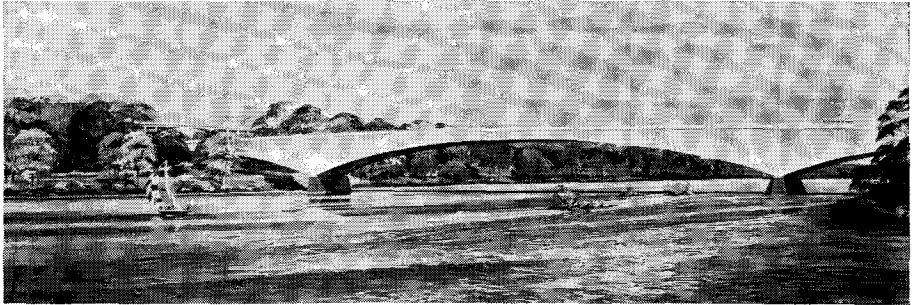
Proposed prestressed concrete cantilever bridge for I-266 Potomac River crossing near Three Sisters Islands
